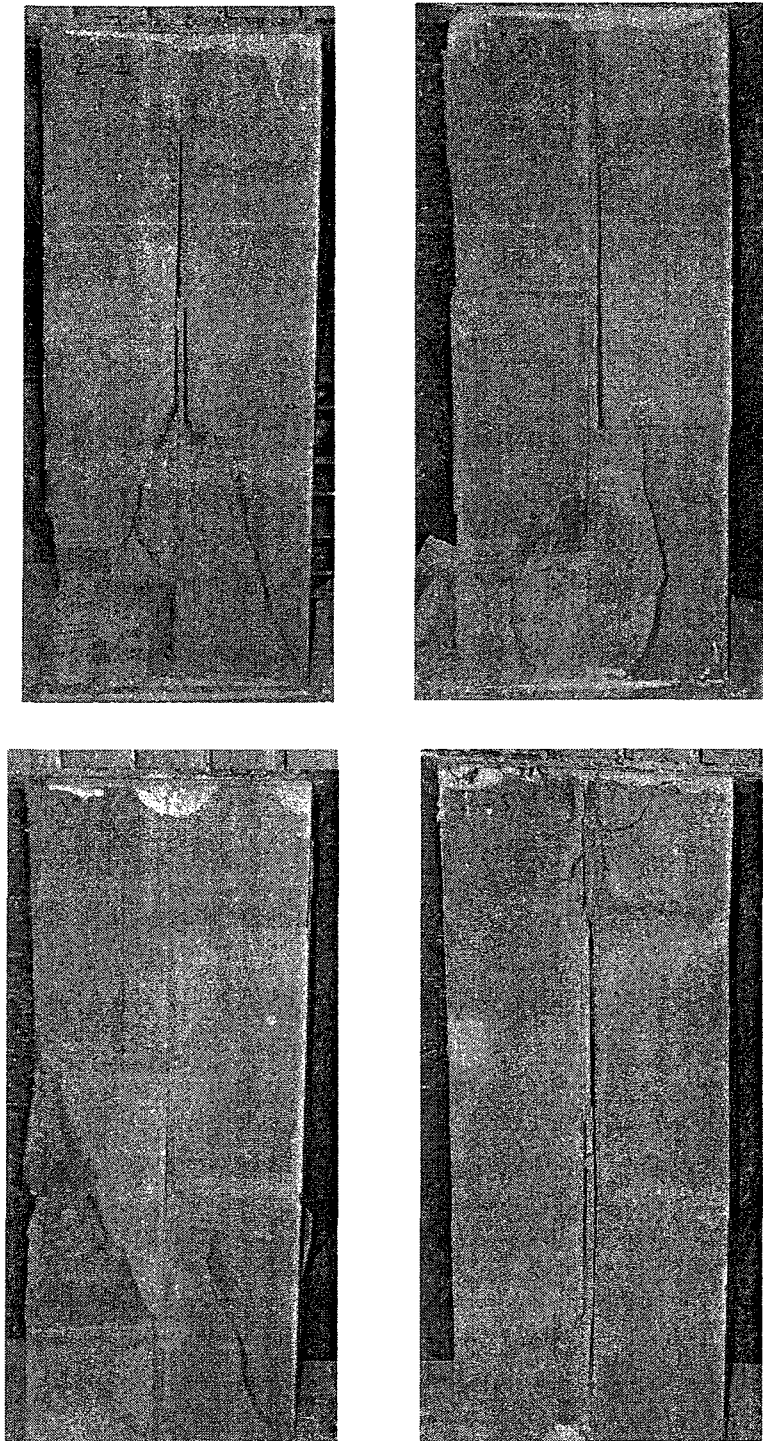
Failed compressive masonry prisms with 2" cores, loaded parallel to their bed joints.
